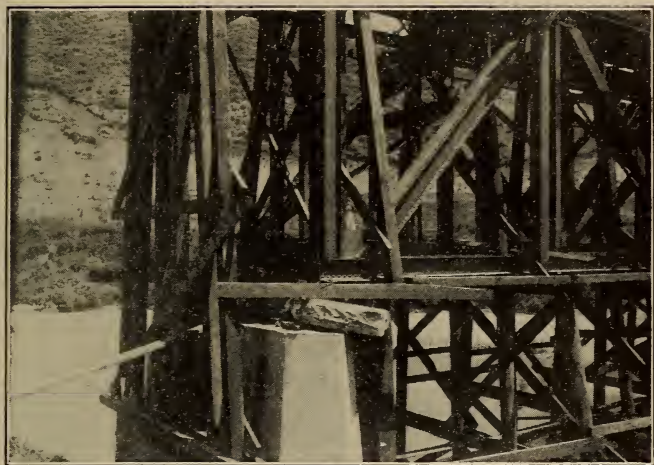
First Intermediate Pier, West End, Pájaro River Bridge, Southern Pacific Railroad.
